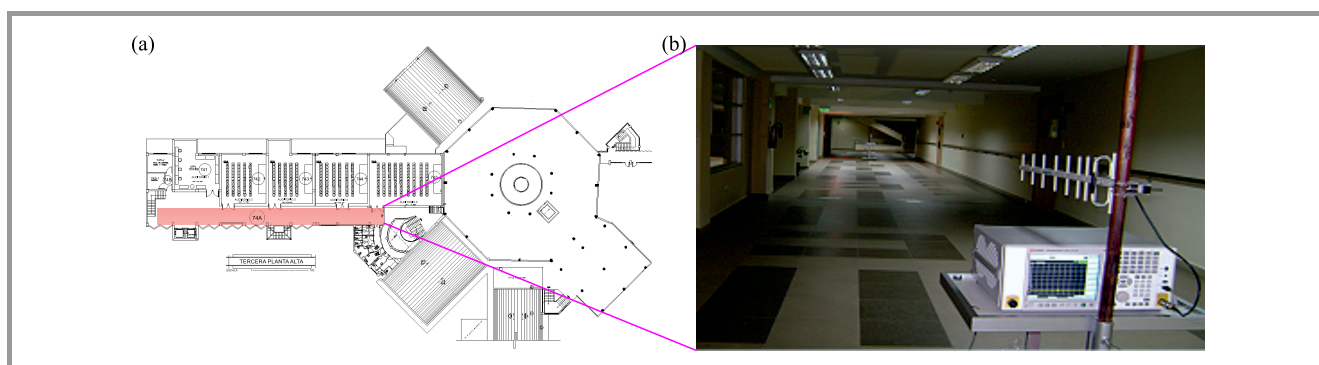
LOS type building: (a) architectural plan and (b) corridors.
